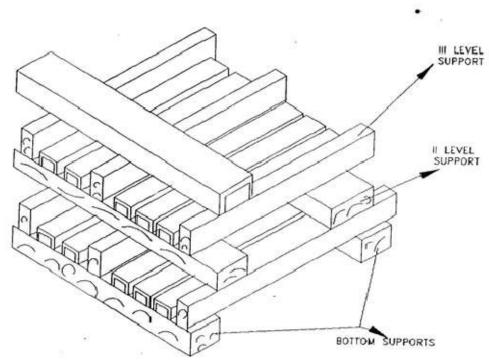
STRUCTURAL STEEL STACKING ARRANGEMENT
